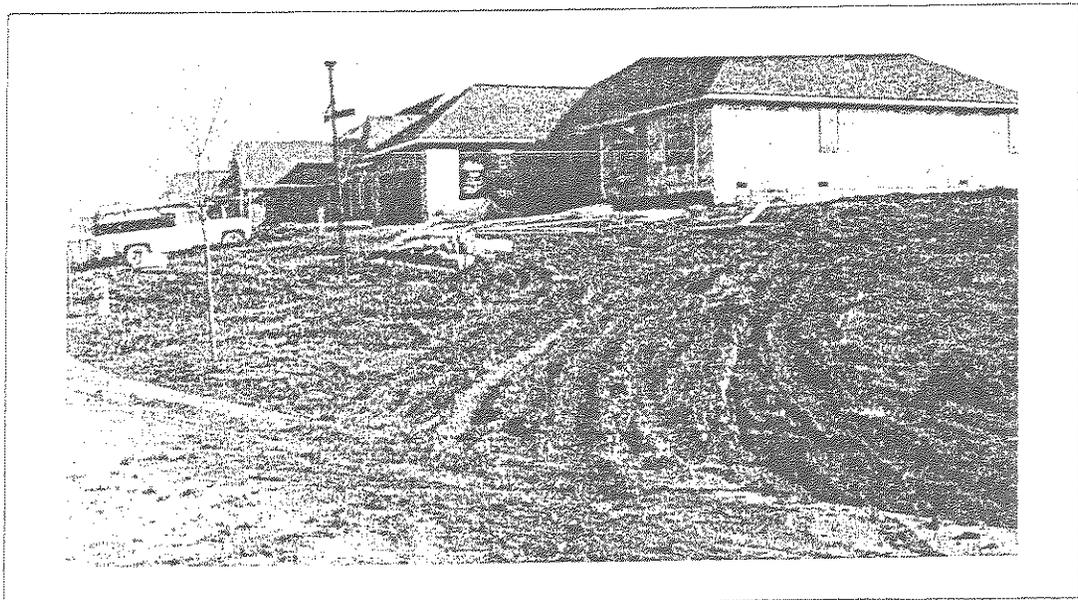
D. Inadequate runoff control allows sediment to be tracked or washed onto the road and into storm sewers.
